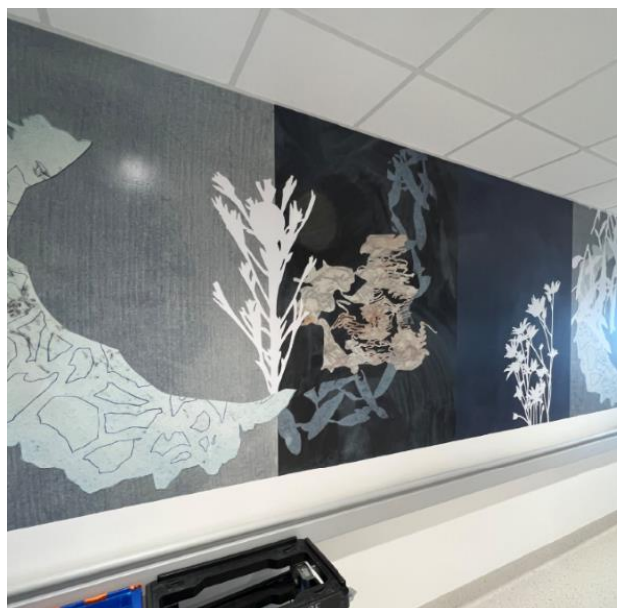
Wall Linings installed to walls of Public Corridors in HI projects.
